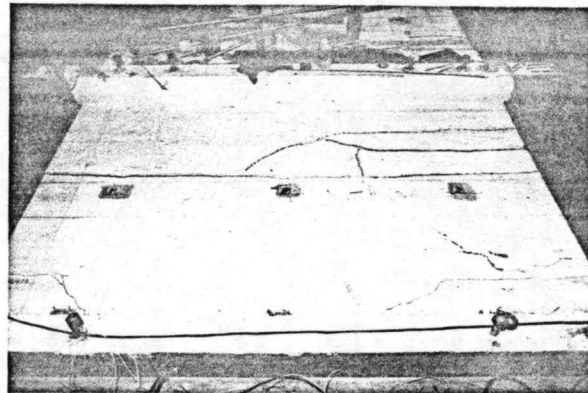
Crack Pattern of Panel 3 Specimen F-2
